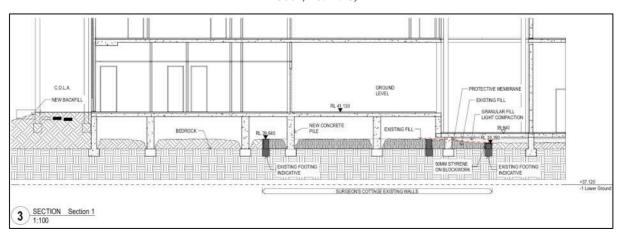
Section demonstrating methodology for bridging and retaining footings of Surgeon's Cottage (Source: FJMT 2019 DA-5004, 18.12.19)
